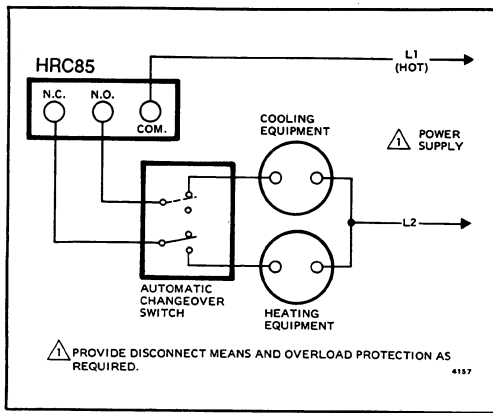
HRC85 in heat-cool control for separate heating and cooling equipment.
